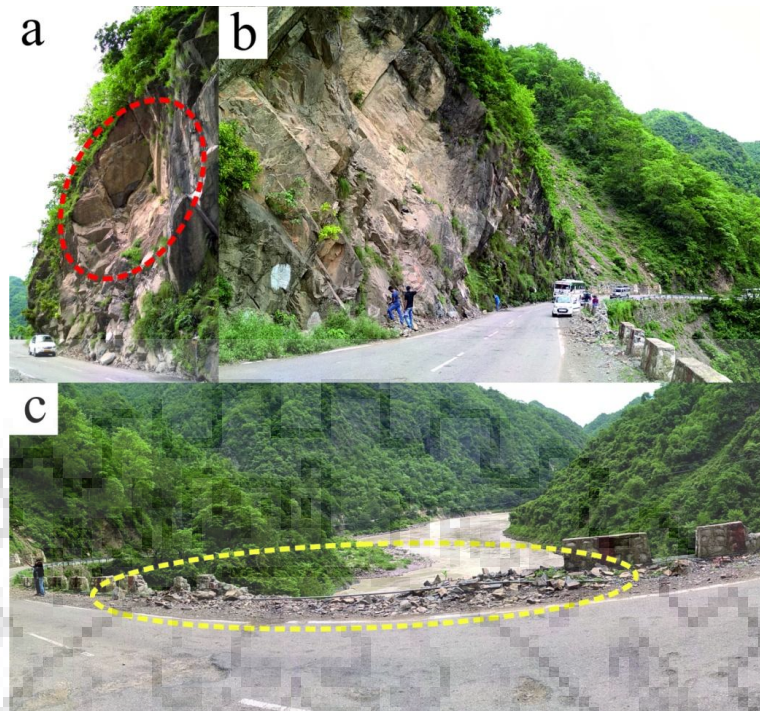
Rockfall on road at slope S15 near Kaudiyala (a) Encircled portion highlighting the zone of wedge initiation (b) Damaged road pavement roadside guarders and walls (c) Inset view showing the damage to the road and associated structures
